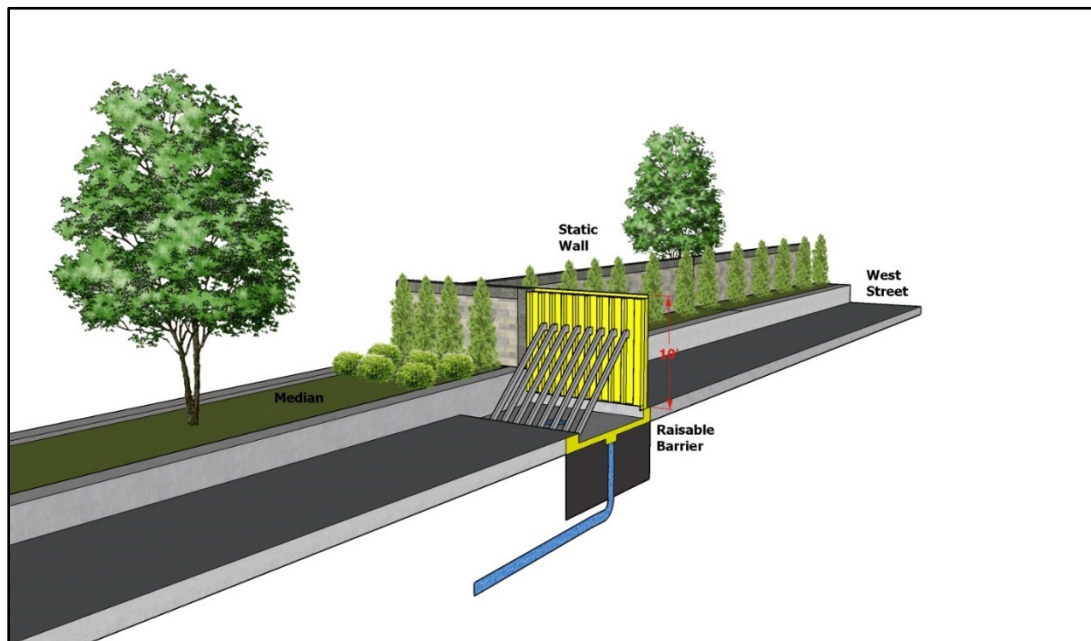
Cross Section View of Deployable Wall in Deployed Position
